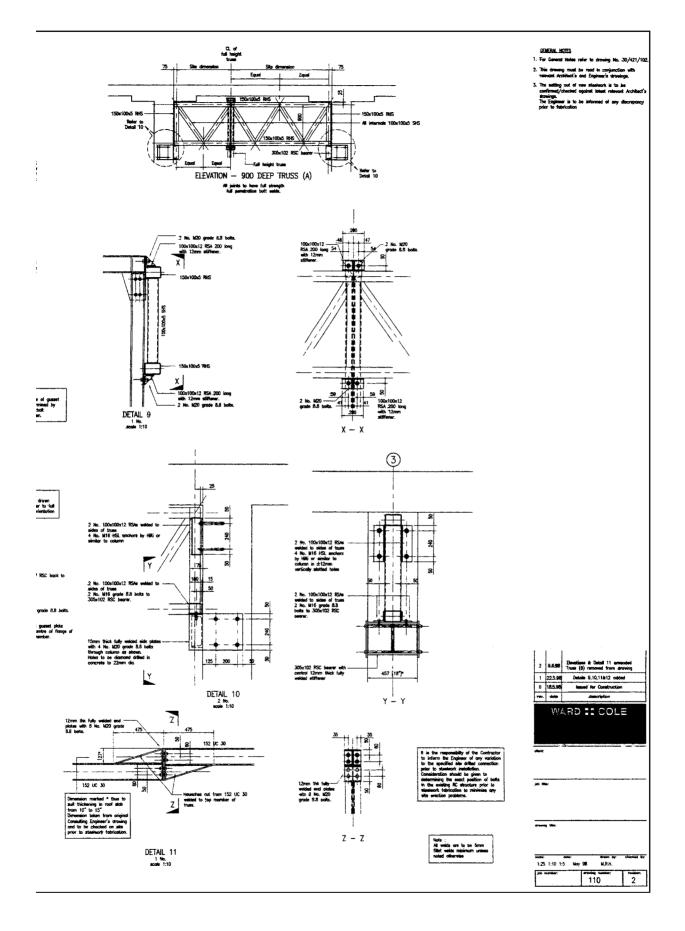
Sectional elevation and structural details of a steel truss
